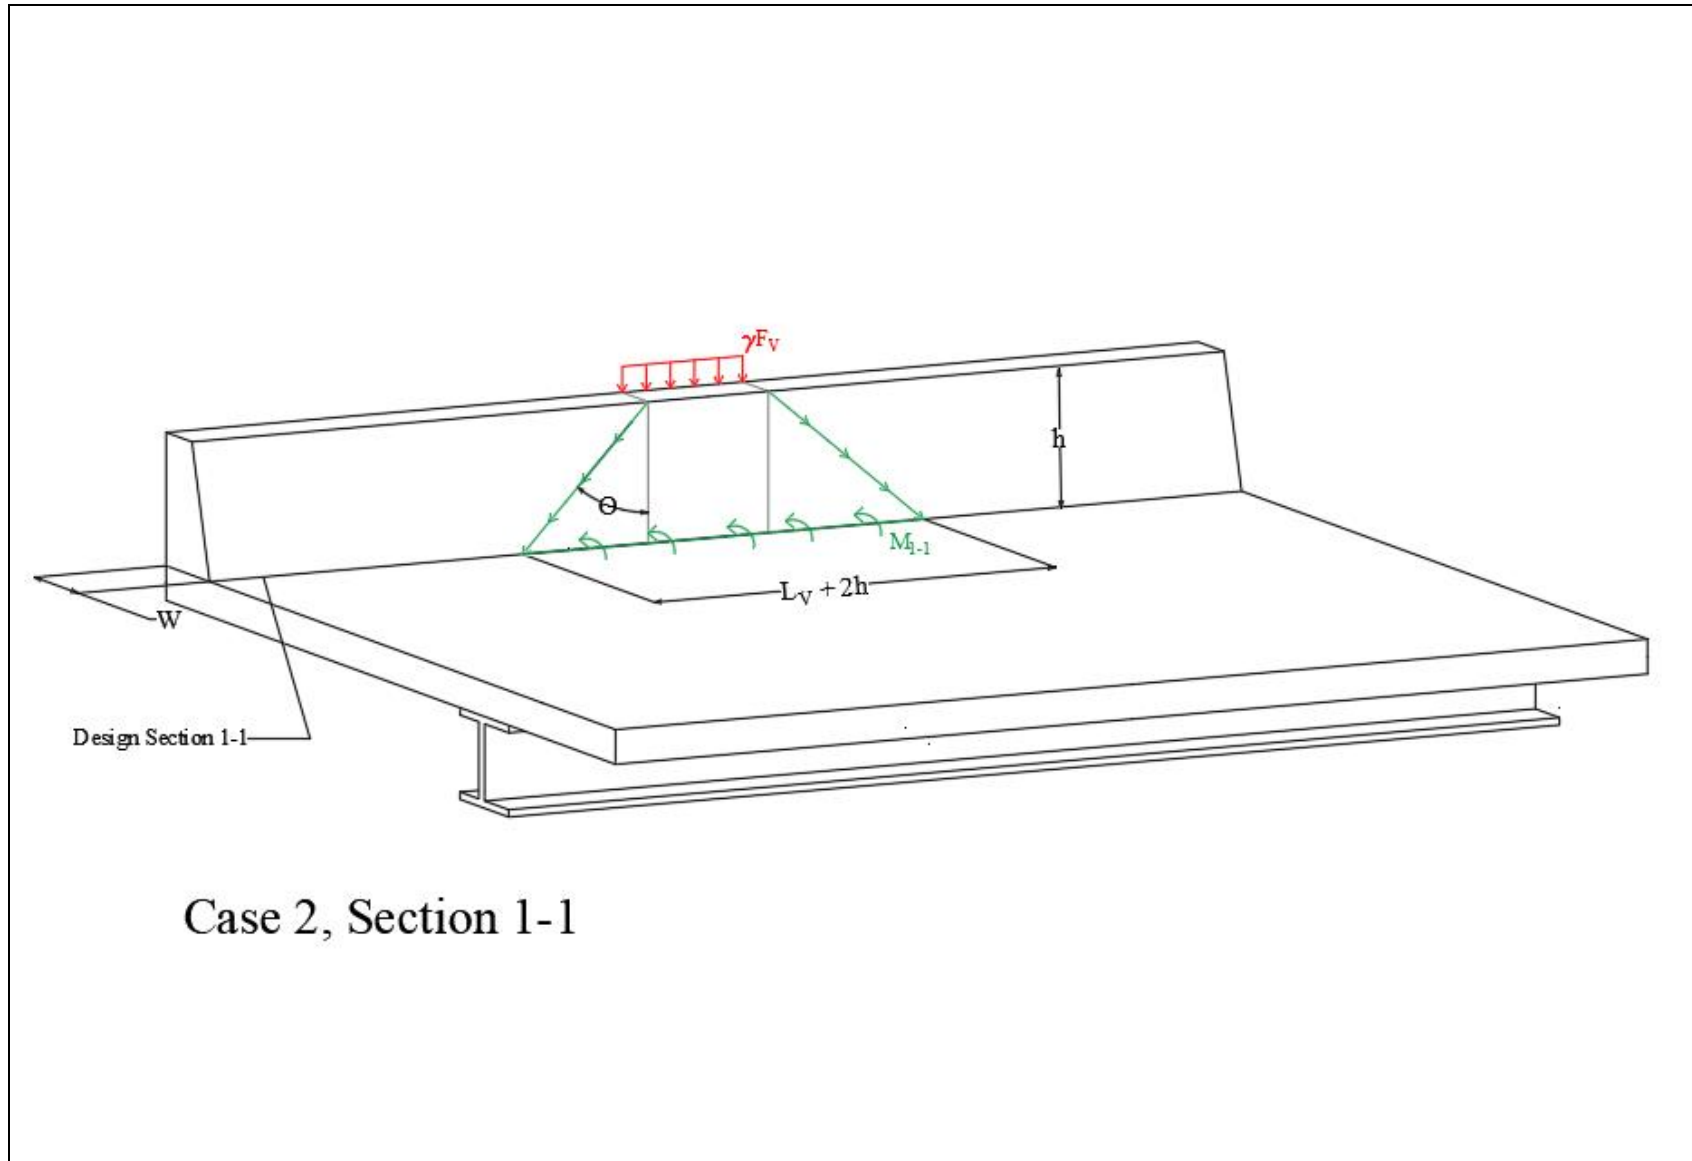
Generic Bridge Rail for Load Case 2, Section 1-1
